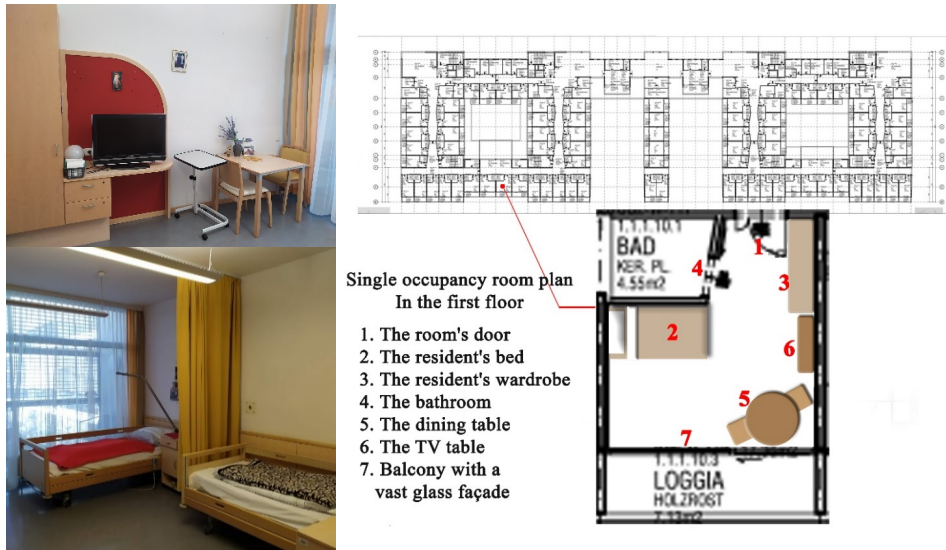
Floor plan and images of a typical resident's room in the Alzheimer's center
